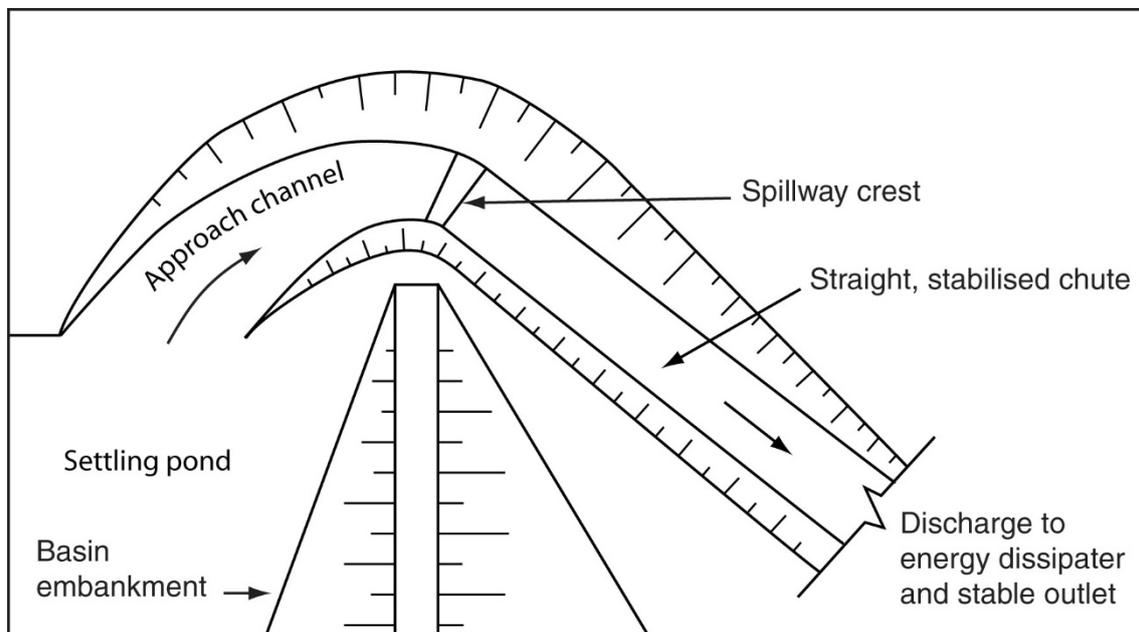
Typical layout for an emergency spillway adjacent an earth fill *Sediment Basin* embankment
